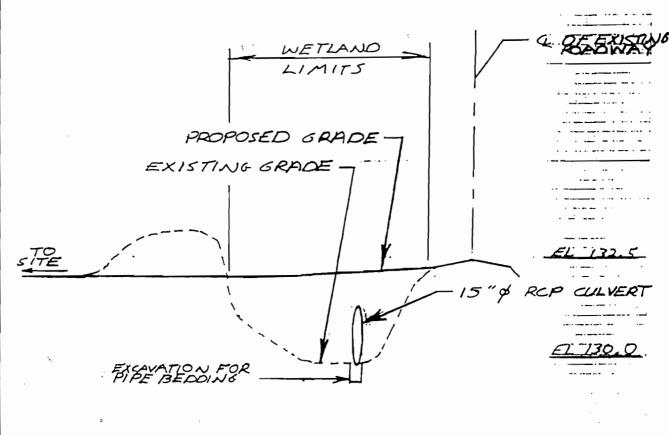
Plan View of the Entrance Road (The Ditch Crossing at Culverts C-12 and C-13 may Impact the Wetlands) 738 Bainett 43668 4/1/94
